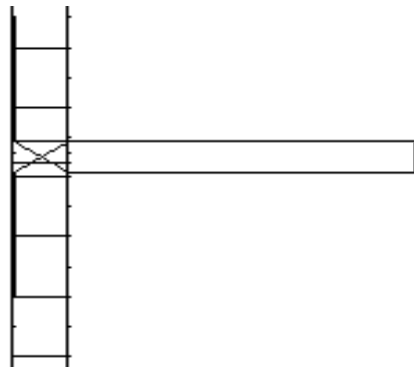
Shear wall – slab connection for 45 degree cross bars configuration (Type II)
